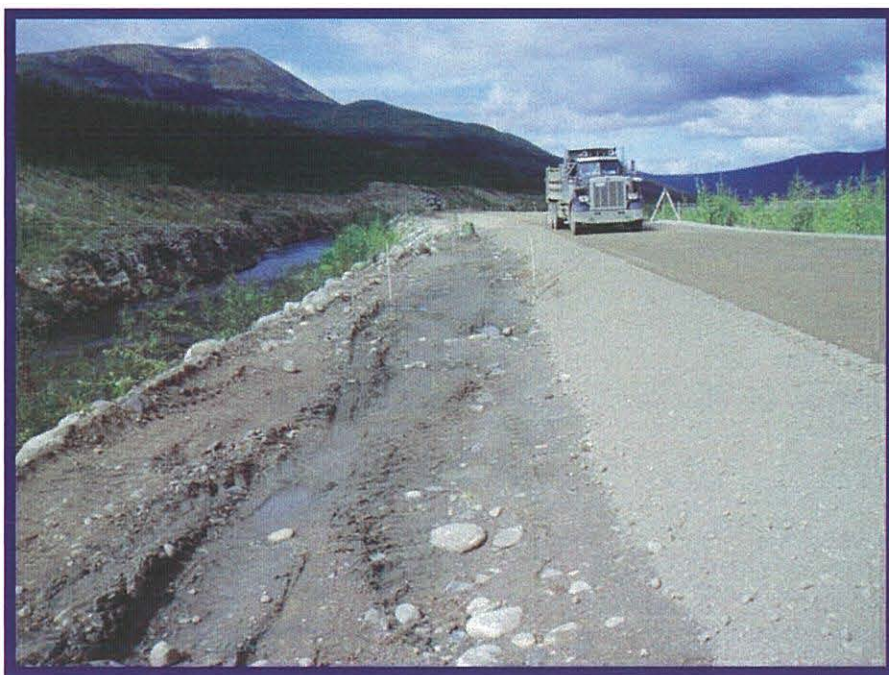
shows a view looking to the east from station 0+725. Note the wide space between the stakes, this area needs to be filled with granular fill prior to riprap placement.
